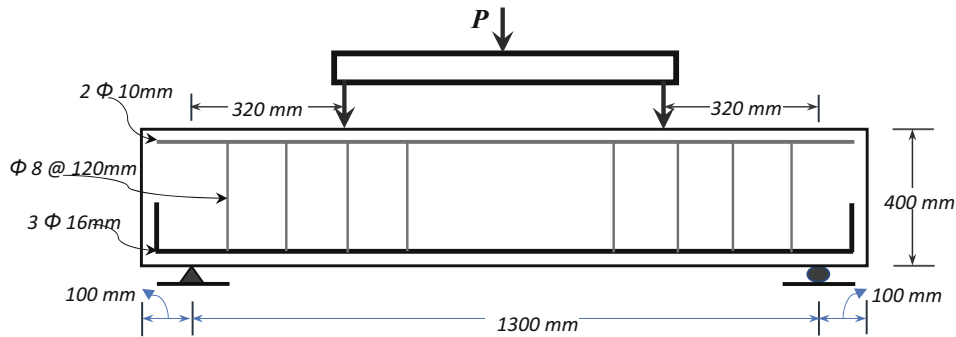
Dimensions and reinforcement details of tested beams (all dimensions in mm).
